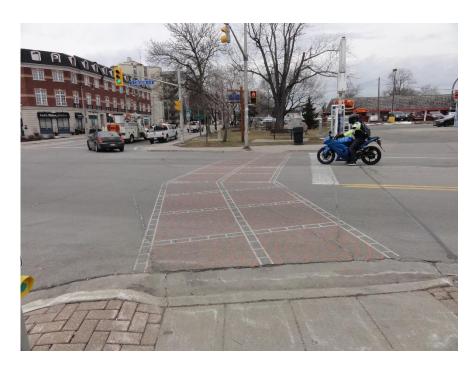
Bent Crosswalk at the Intersection of Lakeshore Road West and Bronte Road
